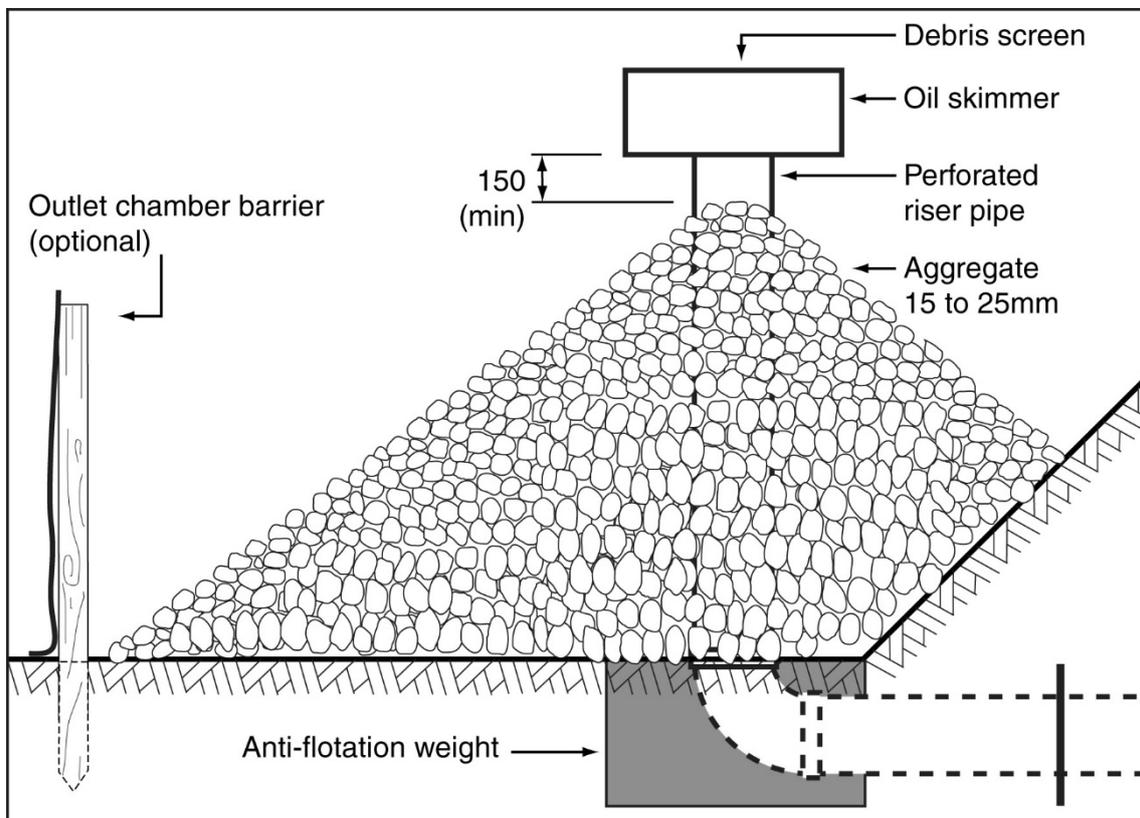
Typical details of riser pipe outlet with aggregate filter
